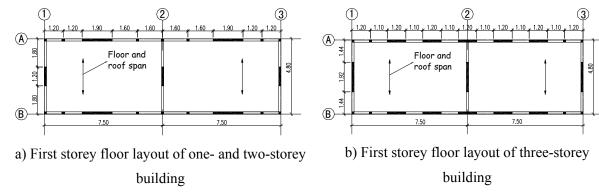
Plan views of the first storey of 4.8 m × 15 m buildings in accordance with the bracing requirements in Canadian codes
